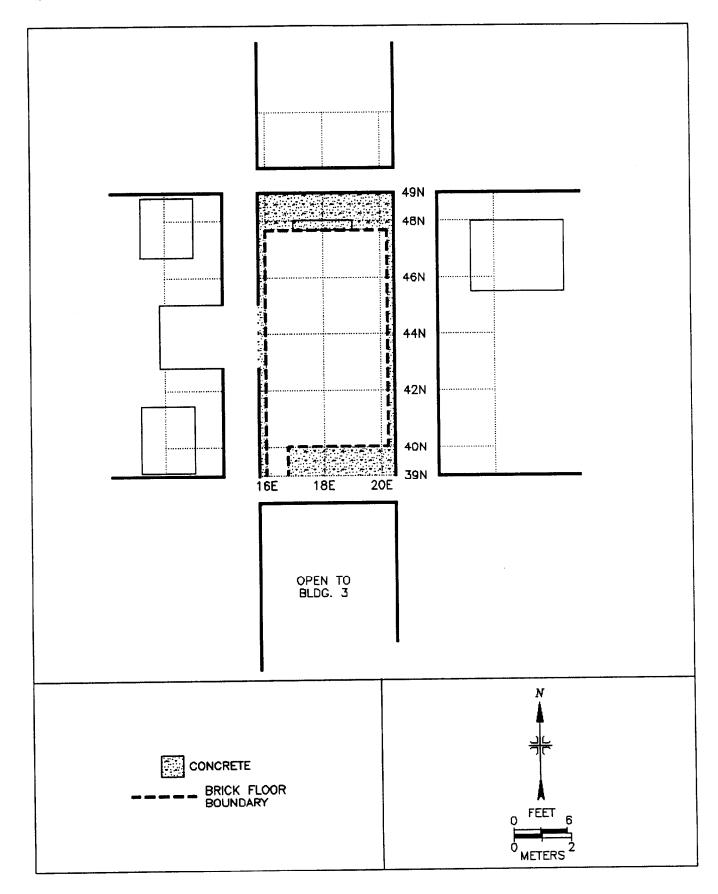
Floor Plan of Building 8, Room B — Reference Grid
